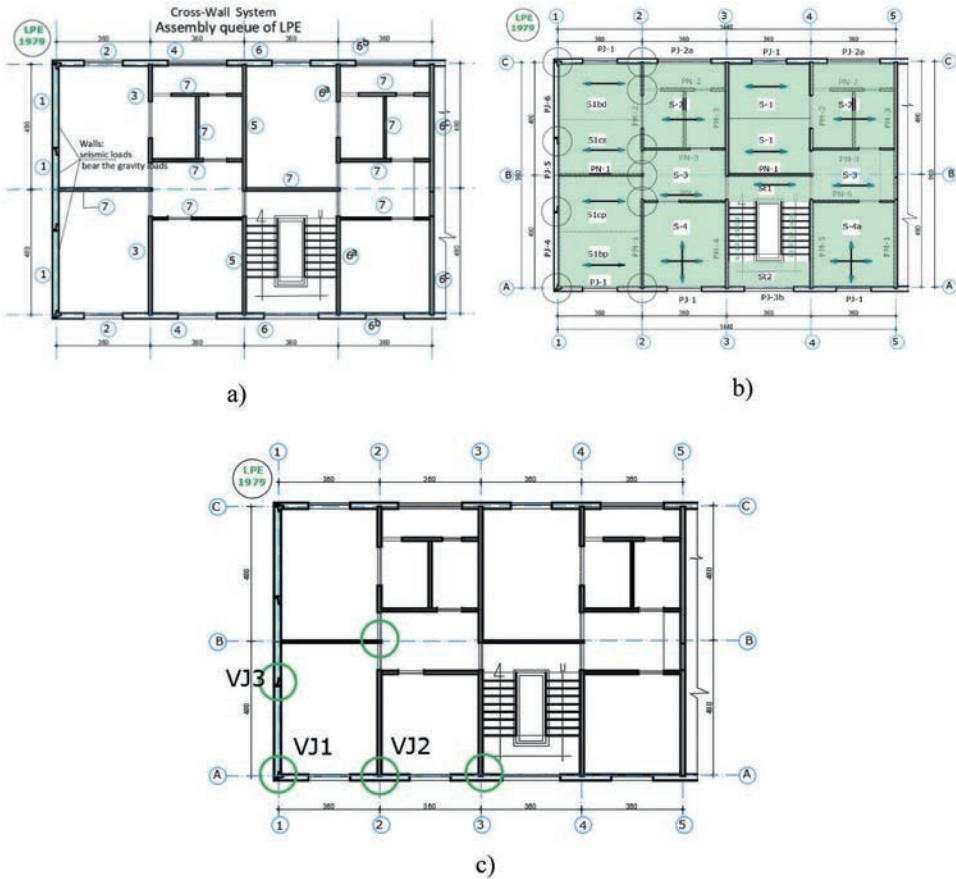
Albanian LPE buildings: a) a floor plan showing assembly scheme for wall panels; b) typical floor plan showing 1-way and 2-way slab panels, and c) floor plan showing the locations of vertical joints VJ1, VJ2, and VJ3.
